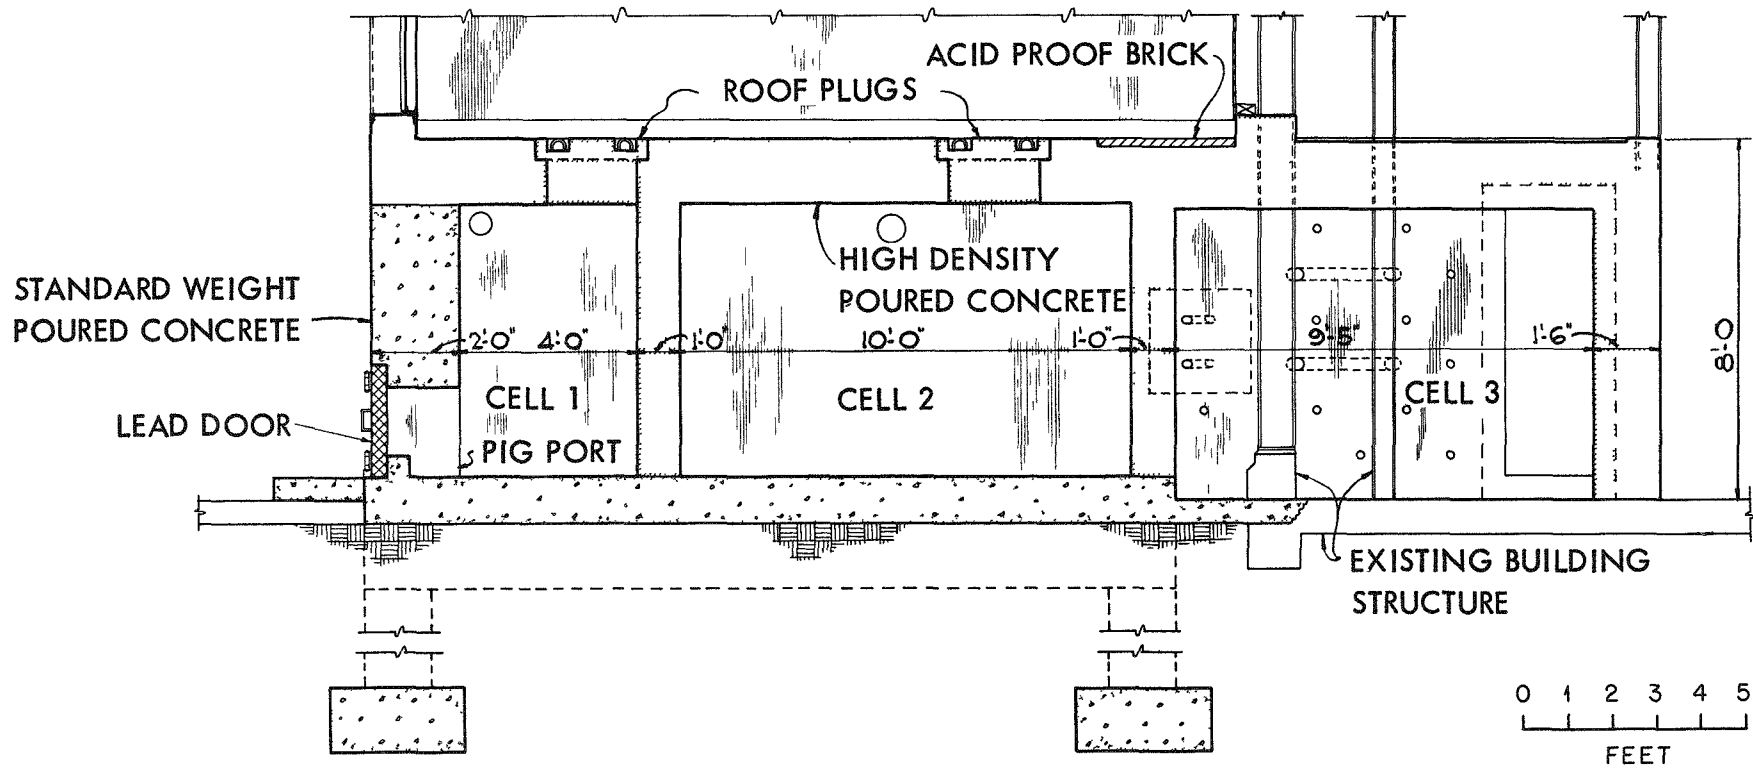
Vertical section of I¹³¹ processing cell, Radioiodine Separation Building, 3028, Oak Ridge.
